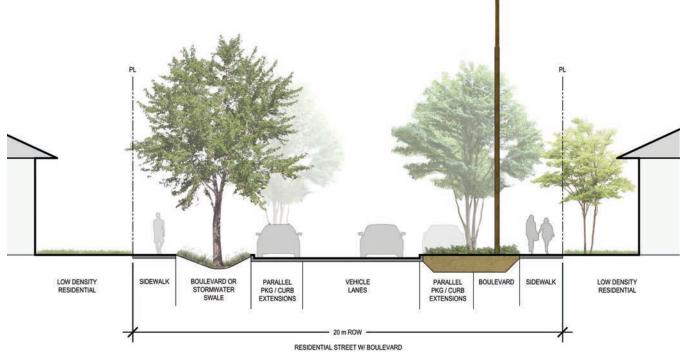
Typical Street Section for a Local Residential Street with Boulevard
